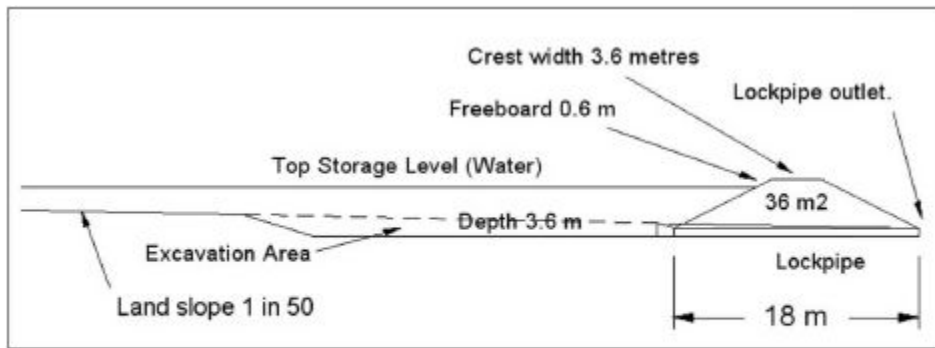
Cross section of excavation area and wall with 1 in 2 batters. Wall is 3.6 metres high. Cross section of excavation area matches the wall cross section, excavation below the pipe is unnecessary.
